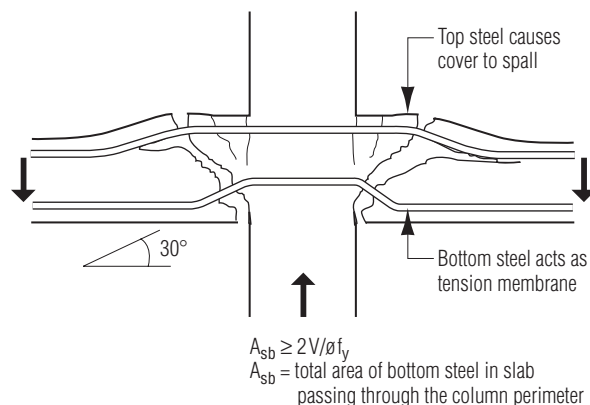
Reinforcement Detailing for Flat Slabs in Accordance with AS 3600 Appendix C
